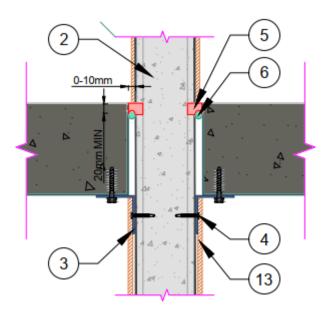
Dual wall system with vertical wall between horizontal walls – gap width of 0-10 mm between the stair and vertically oriented wall
